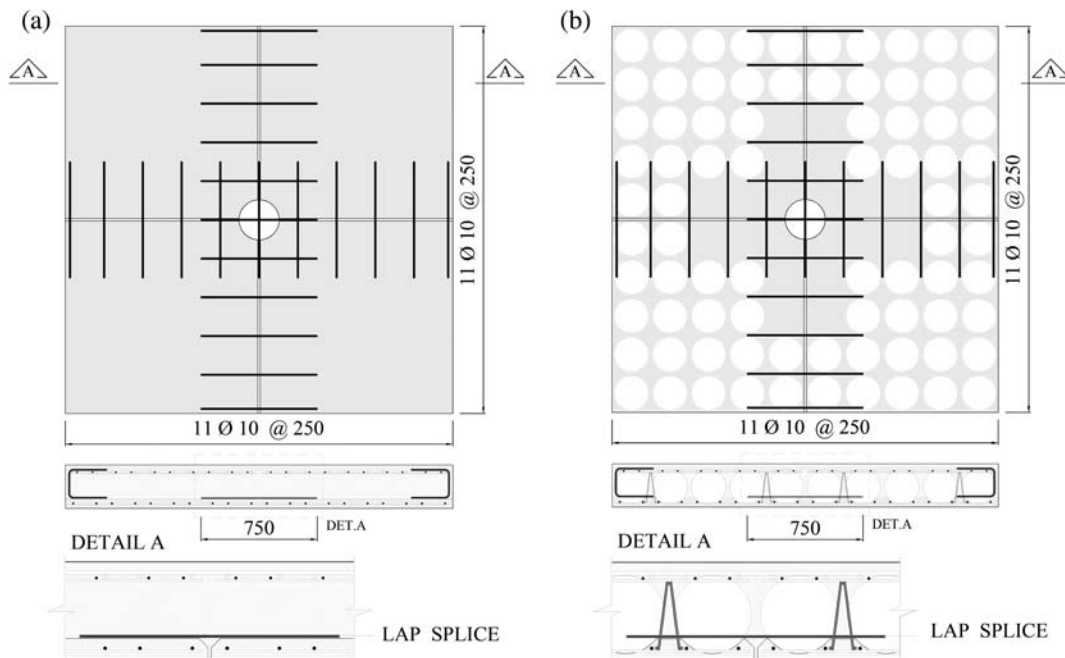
Details of the reinforcement on the joints between adjacent precast layers in the slab: (a) SSP, (b) BDP (dimensions in mm)
